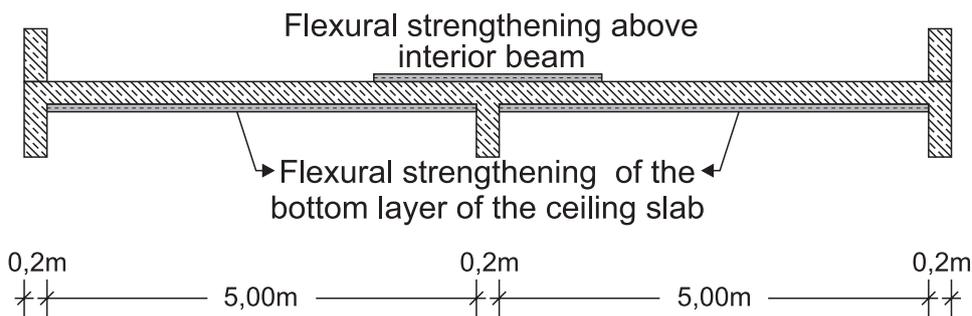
Section A-A of proposed strengthening (see also figure 4.8)
